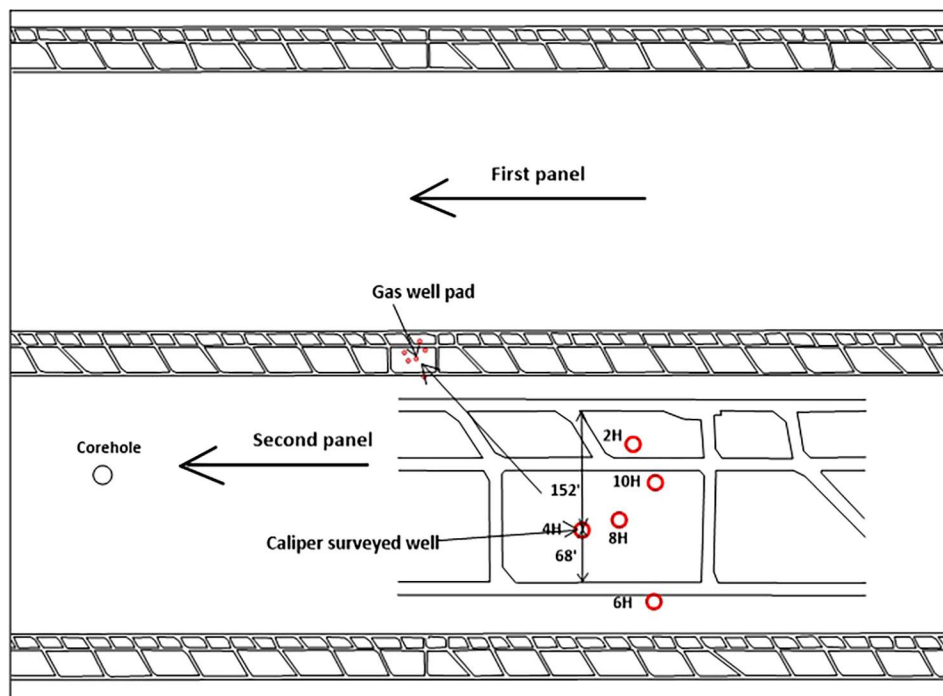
Longwall panel layout and locations of shale gas wells in chain pillars under an overburden depth of 1,307 ft.
